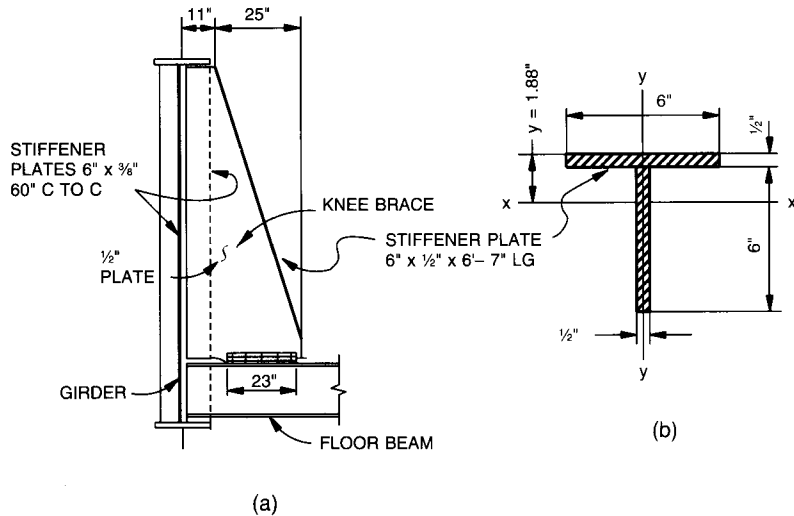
Knee brace for compression flange of through girder. (a) Elevation. (b) Cross section assumed effective.
